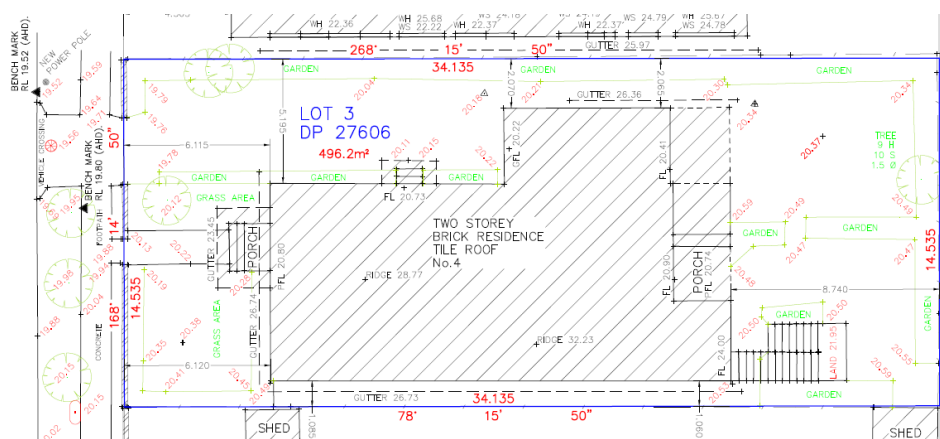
Current survey plan - 4 Chester Avenue, Maroubra (Source: TECA Management Pty Ltd)
